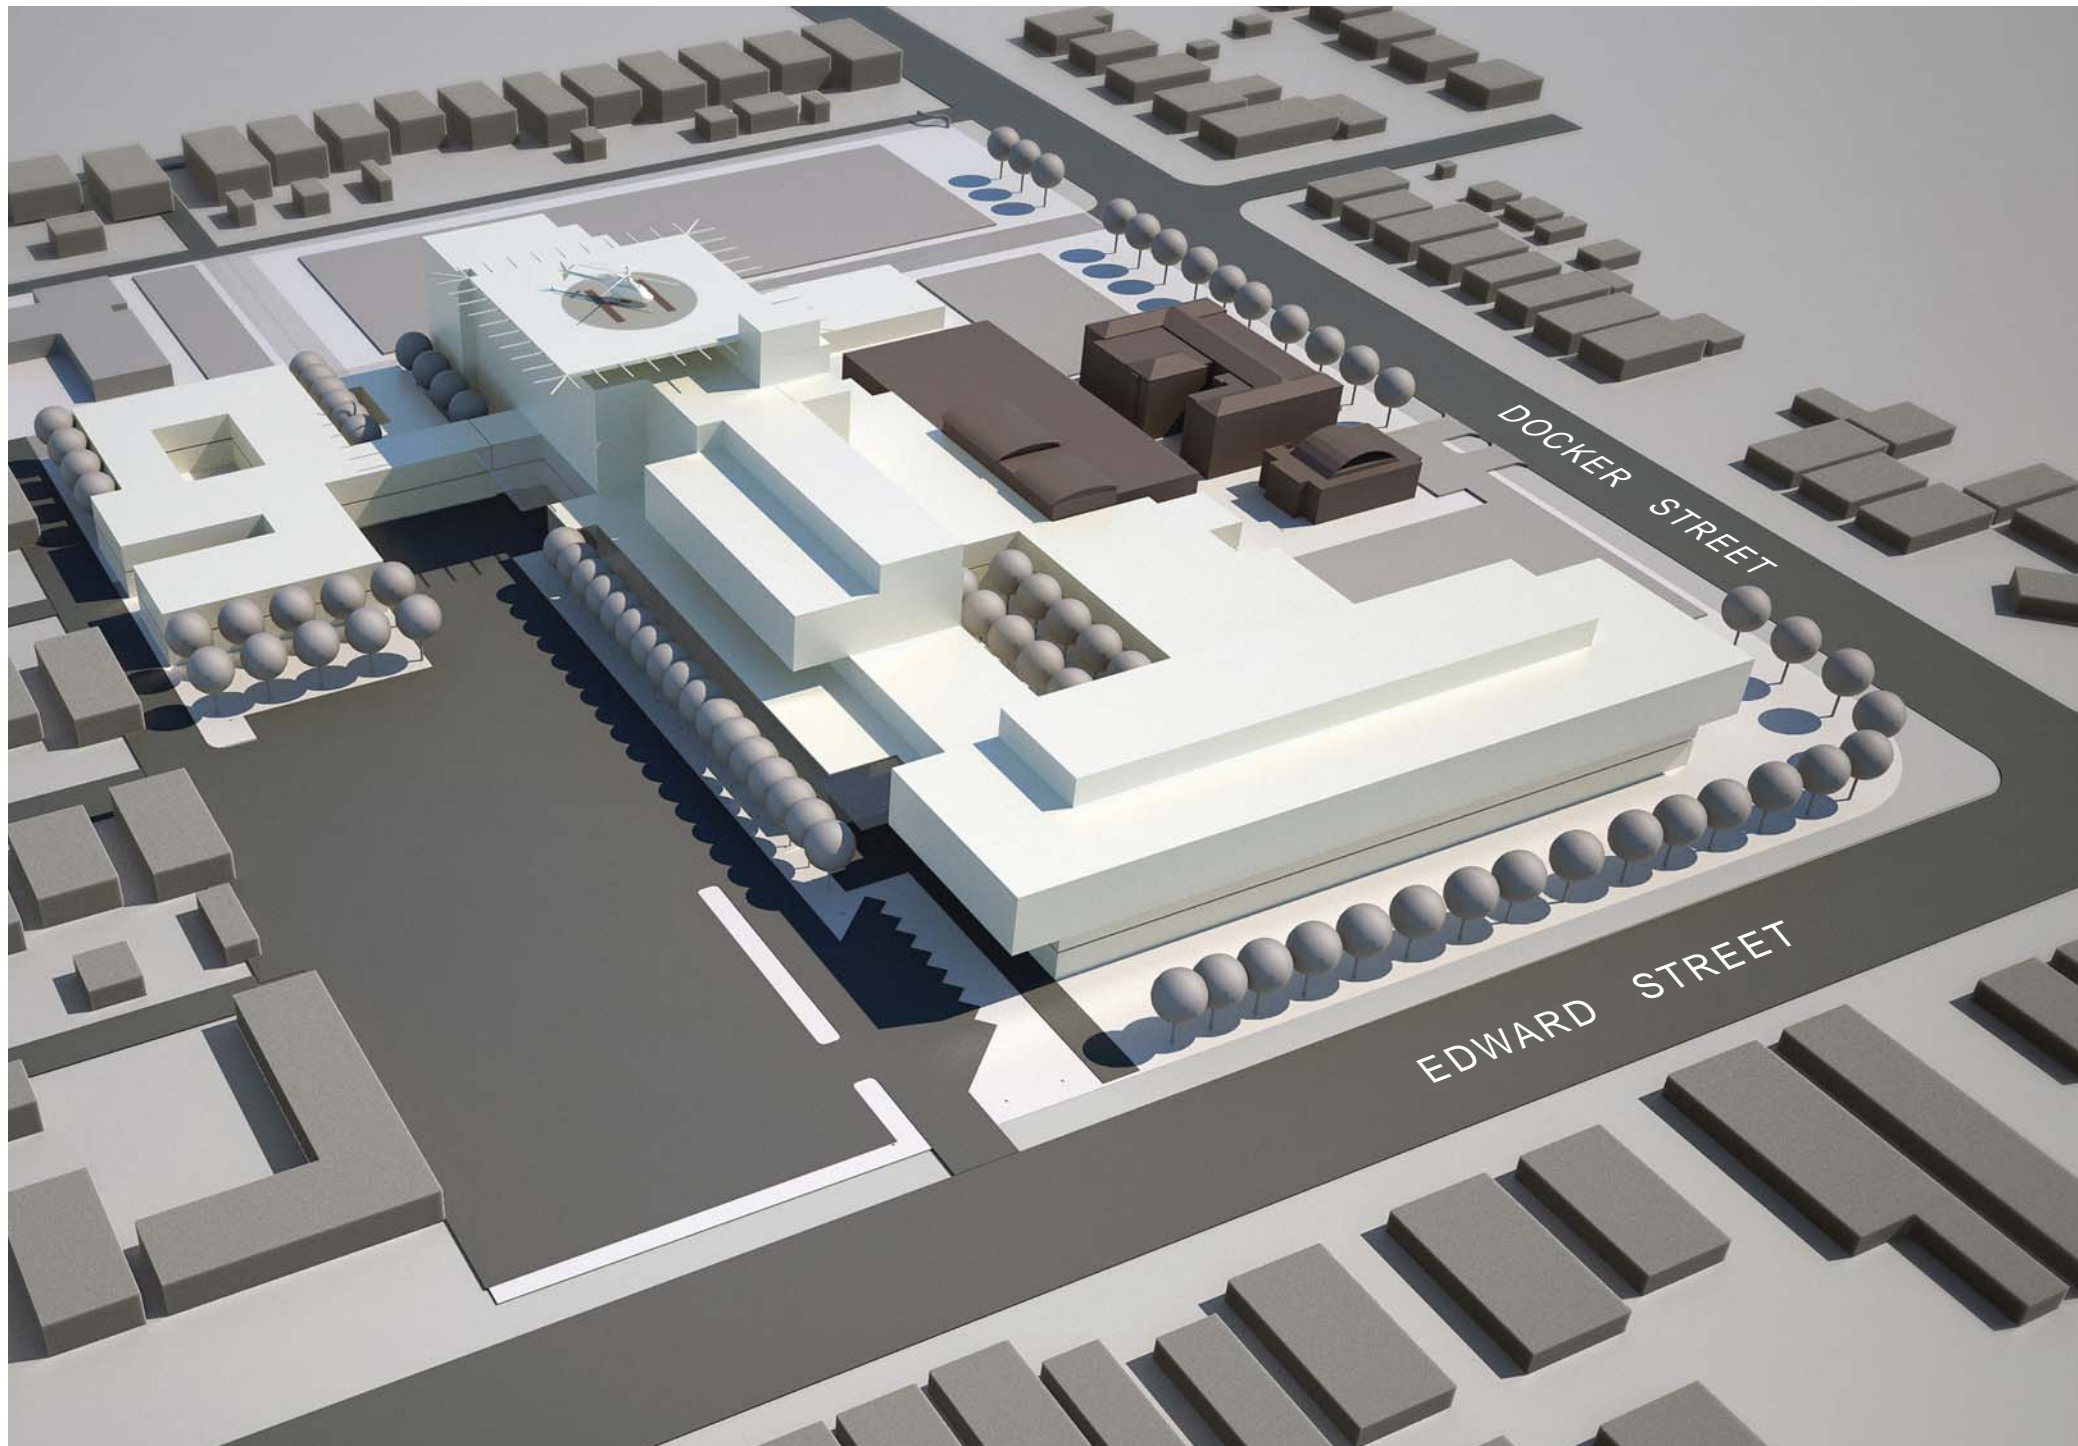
Wagga Wagga Base Hospital Concept Plan
